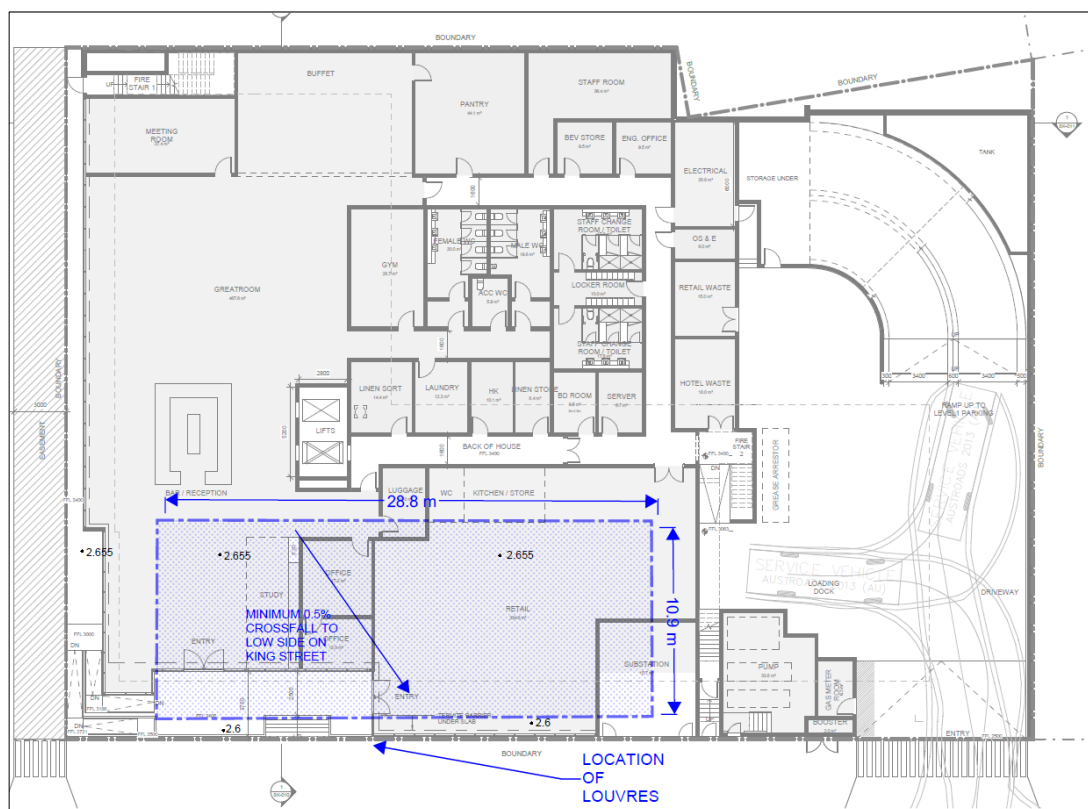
Extract of proposed flood storage layout and details (Source: *Flood Impact Assessment* by Northrop Consulting Engineers)
